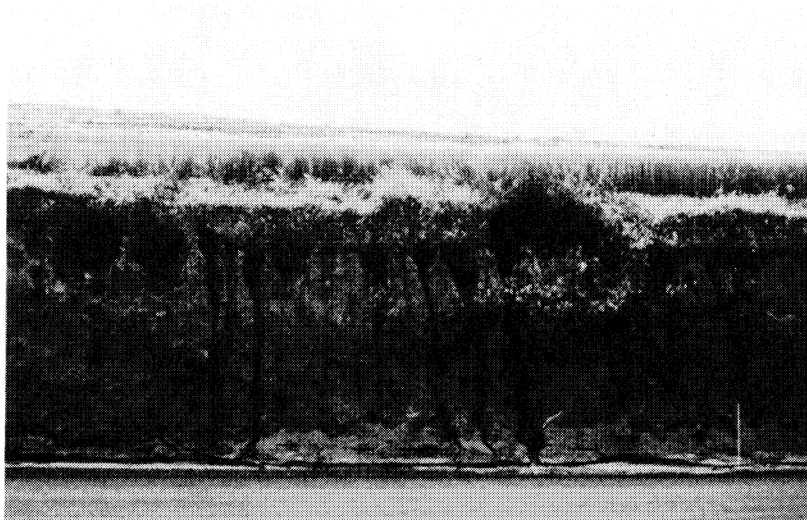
Piping erosion developing into gulley erosion (Highway 12 N.E. of Walla Walla).
